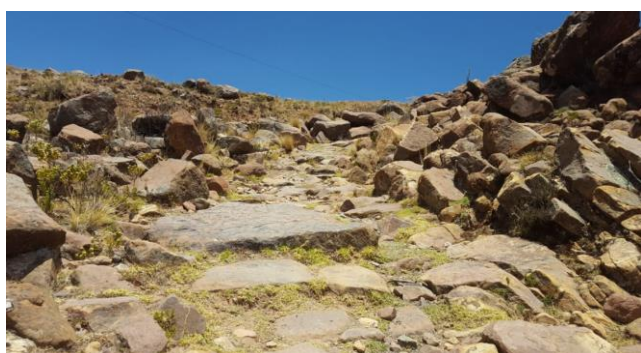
Road with retaining wall. Source: ATLAS Consulting Project - Adjustment Annex 18-2019.
